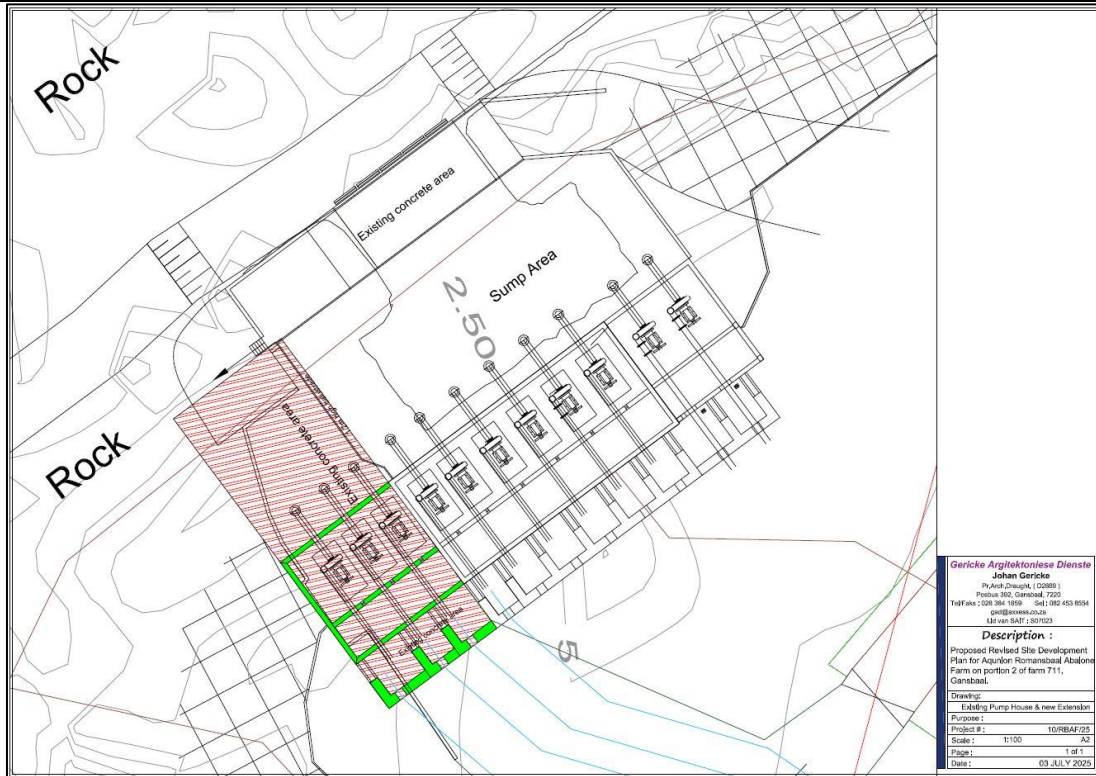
Overview of the pumphouse and the area proposed for the expansion highlighted in green.
